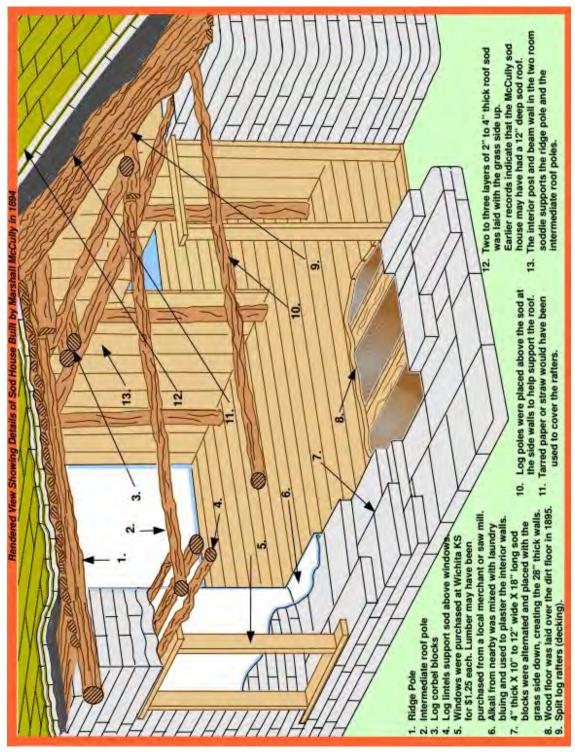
Construction Detail of McCully Sod House (Oklahoma Historical Society)
